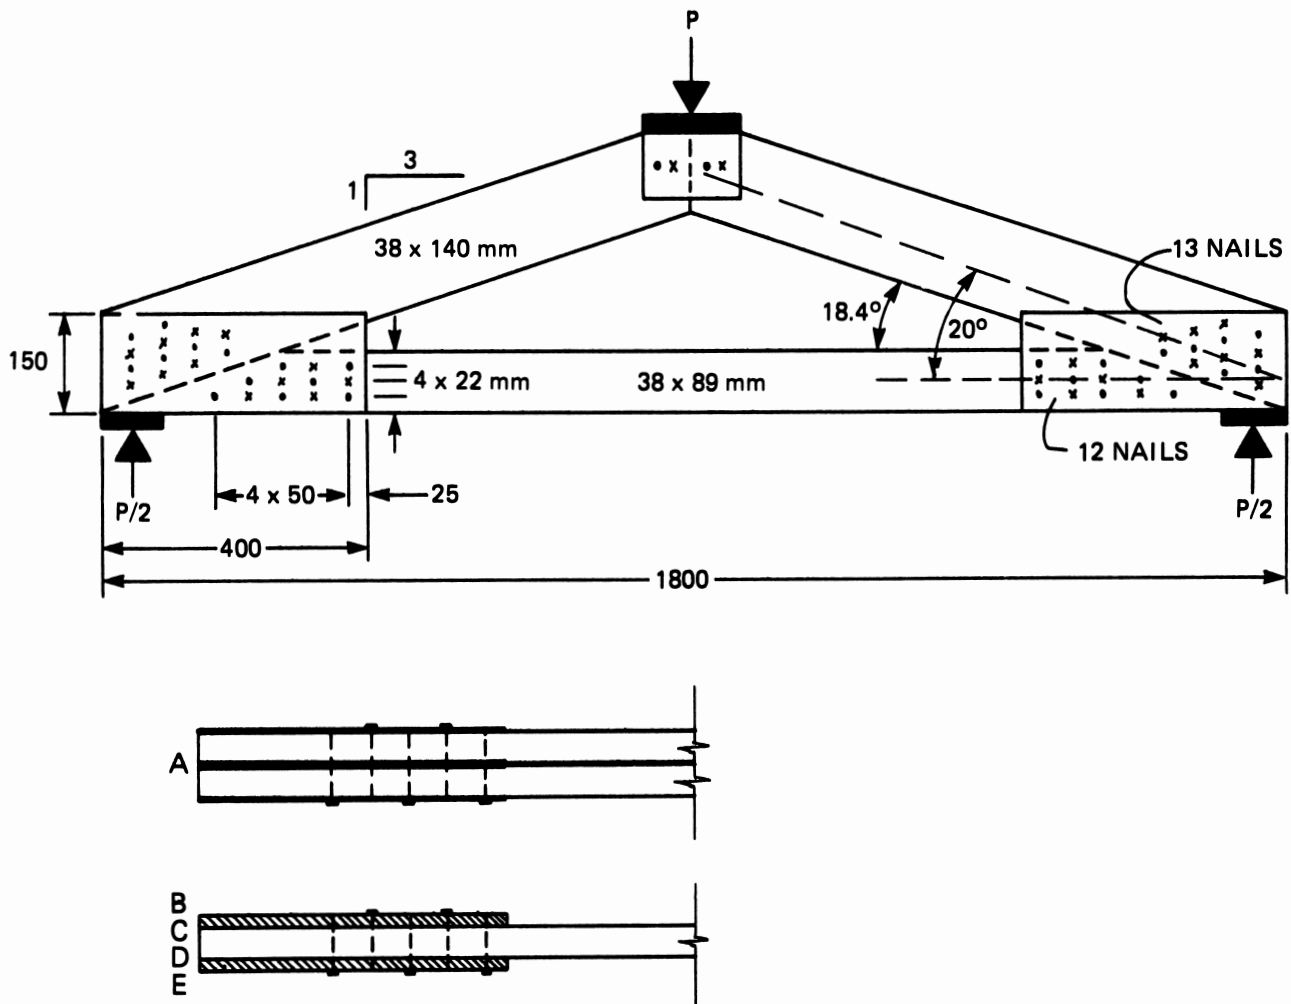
Details of test specimens. (A) 4.4 × 76-mm concrete nails; 0.91-mm galvanized steel side gussets; 1.22-mm galvanized steel center gusset. (B) 4.0 × 64-mm concrete nails; five-ply D. fir gussets. (C) 4.0 × 64-mm concrete nails; four-ply D. fir gussets. (D) 4.0 × 64-mm concrete nails; five-ply spruce gussets. (E) 4.0 × 64-mm concrete nails; four-ply spruce gussets.
